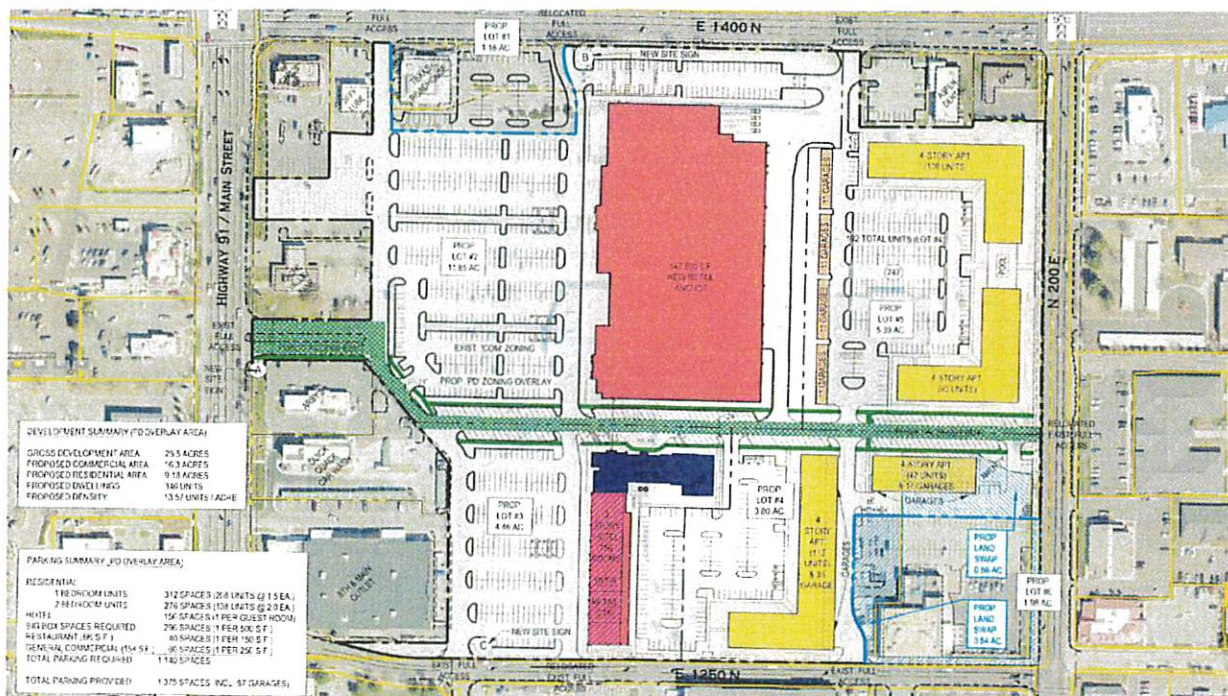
shows the 25.5-acre 2023 site plan with Target and Hotel (red and purple) and multi-family (yellow) buildings.
